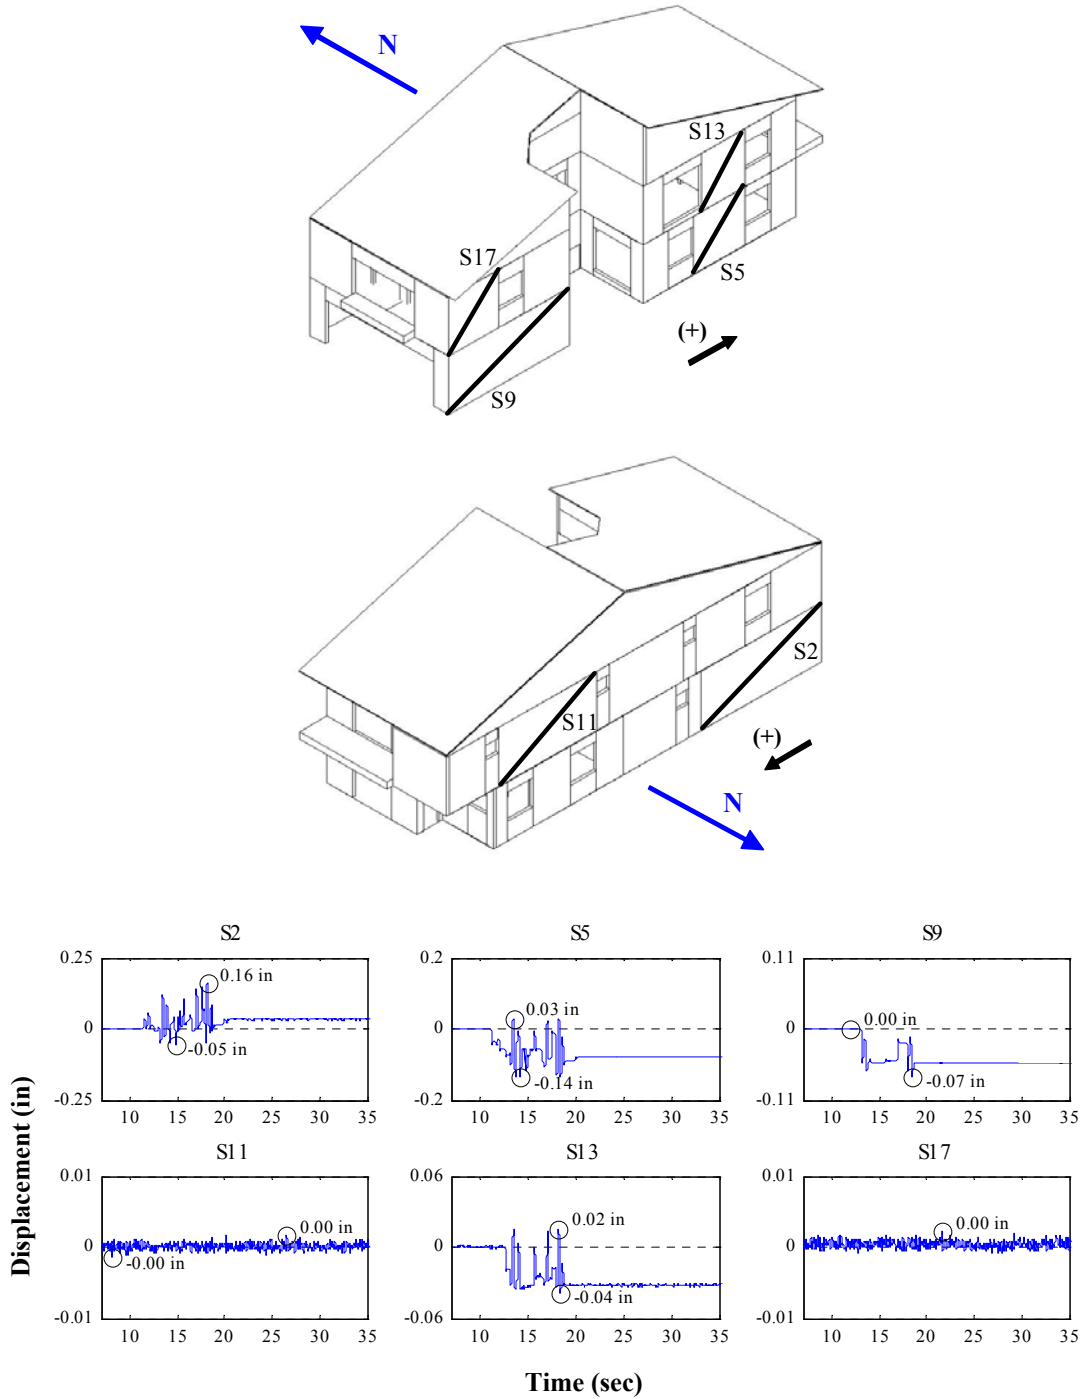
Wall deformations of east-west external walls for Test NWP1S07
